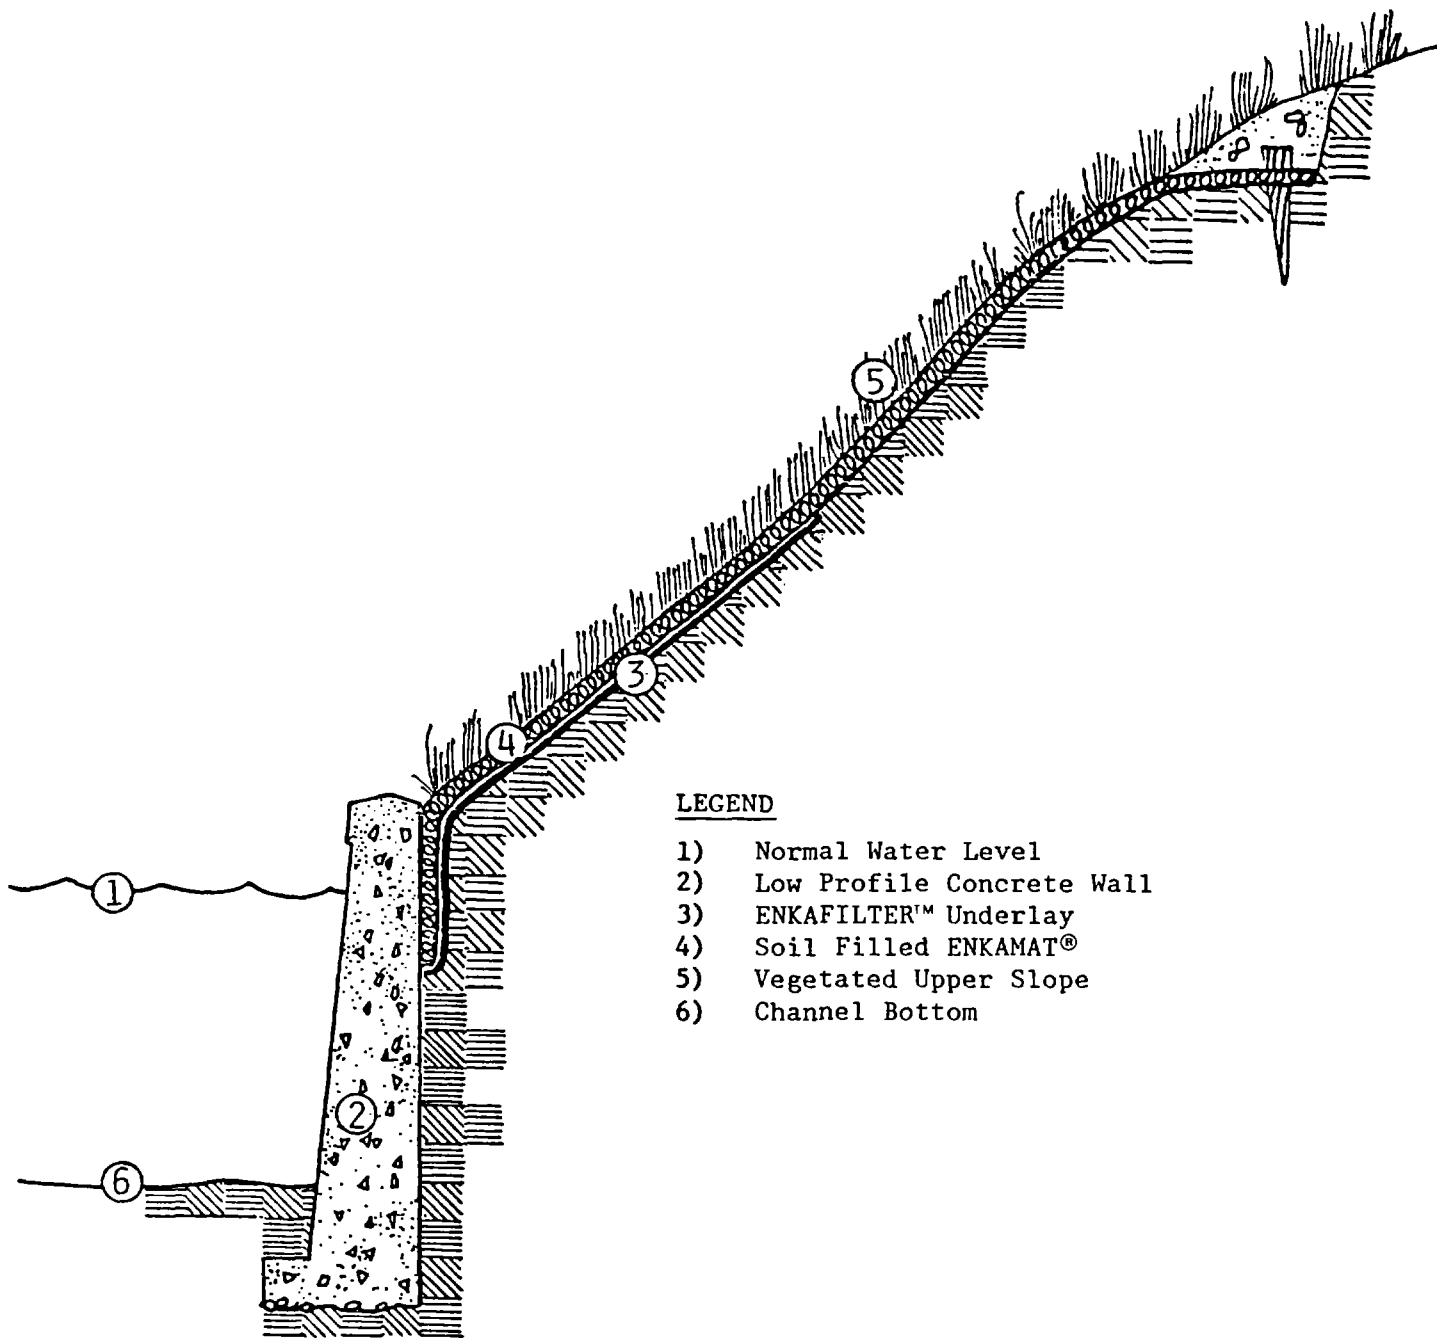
SHORELINE PROTECTION - STEEP WATERWAY BANKS
